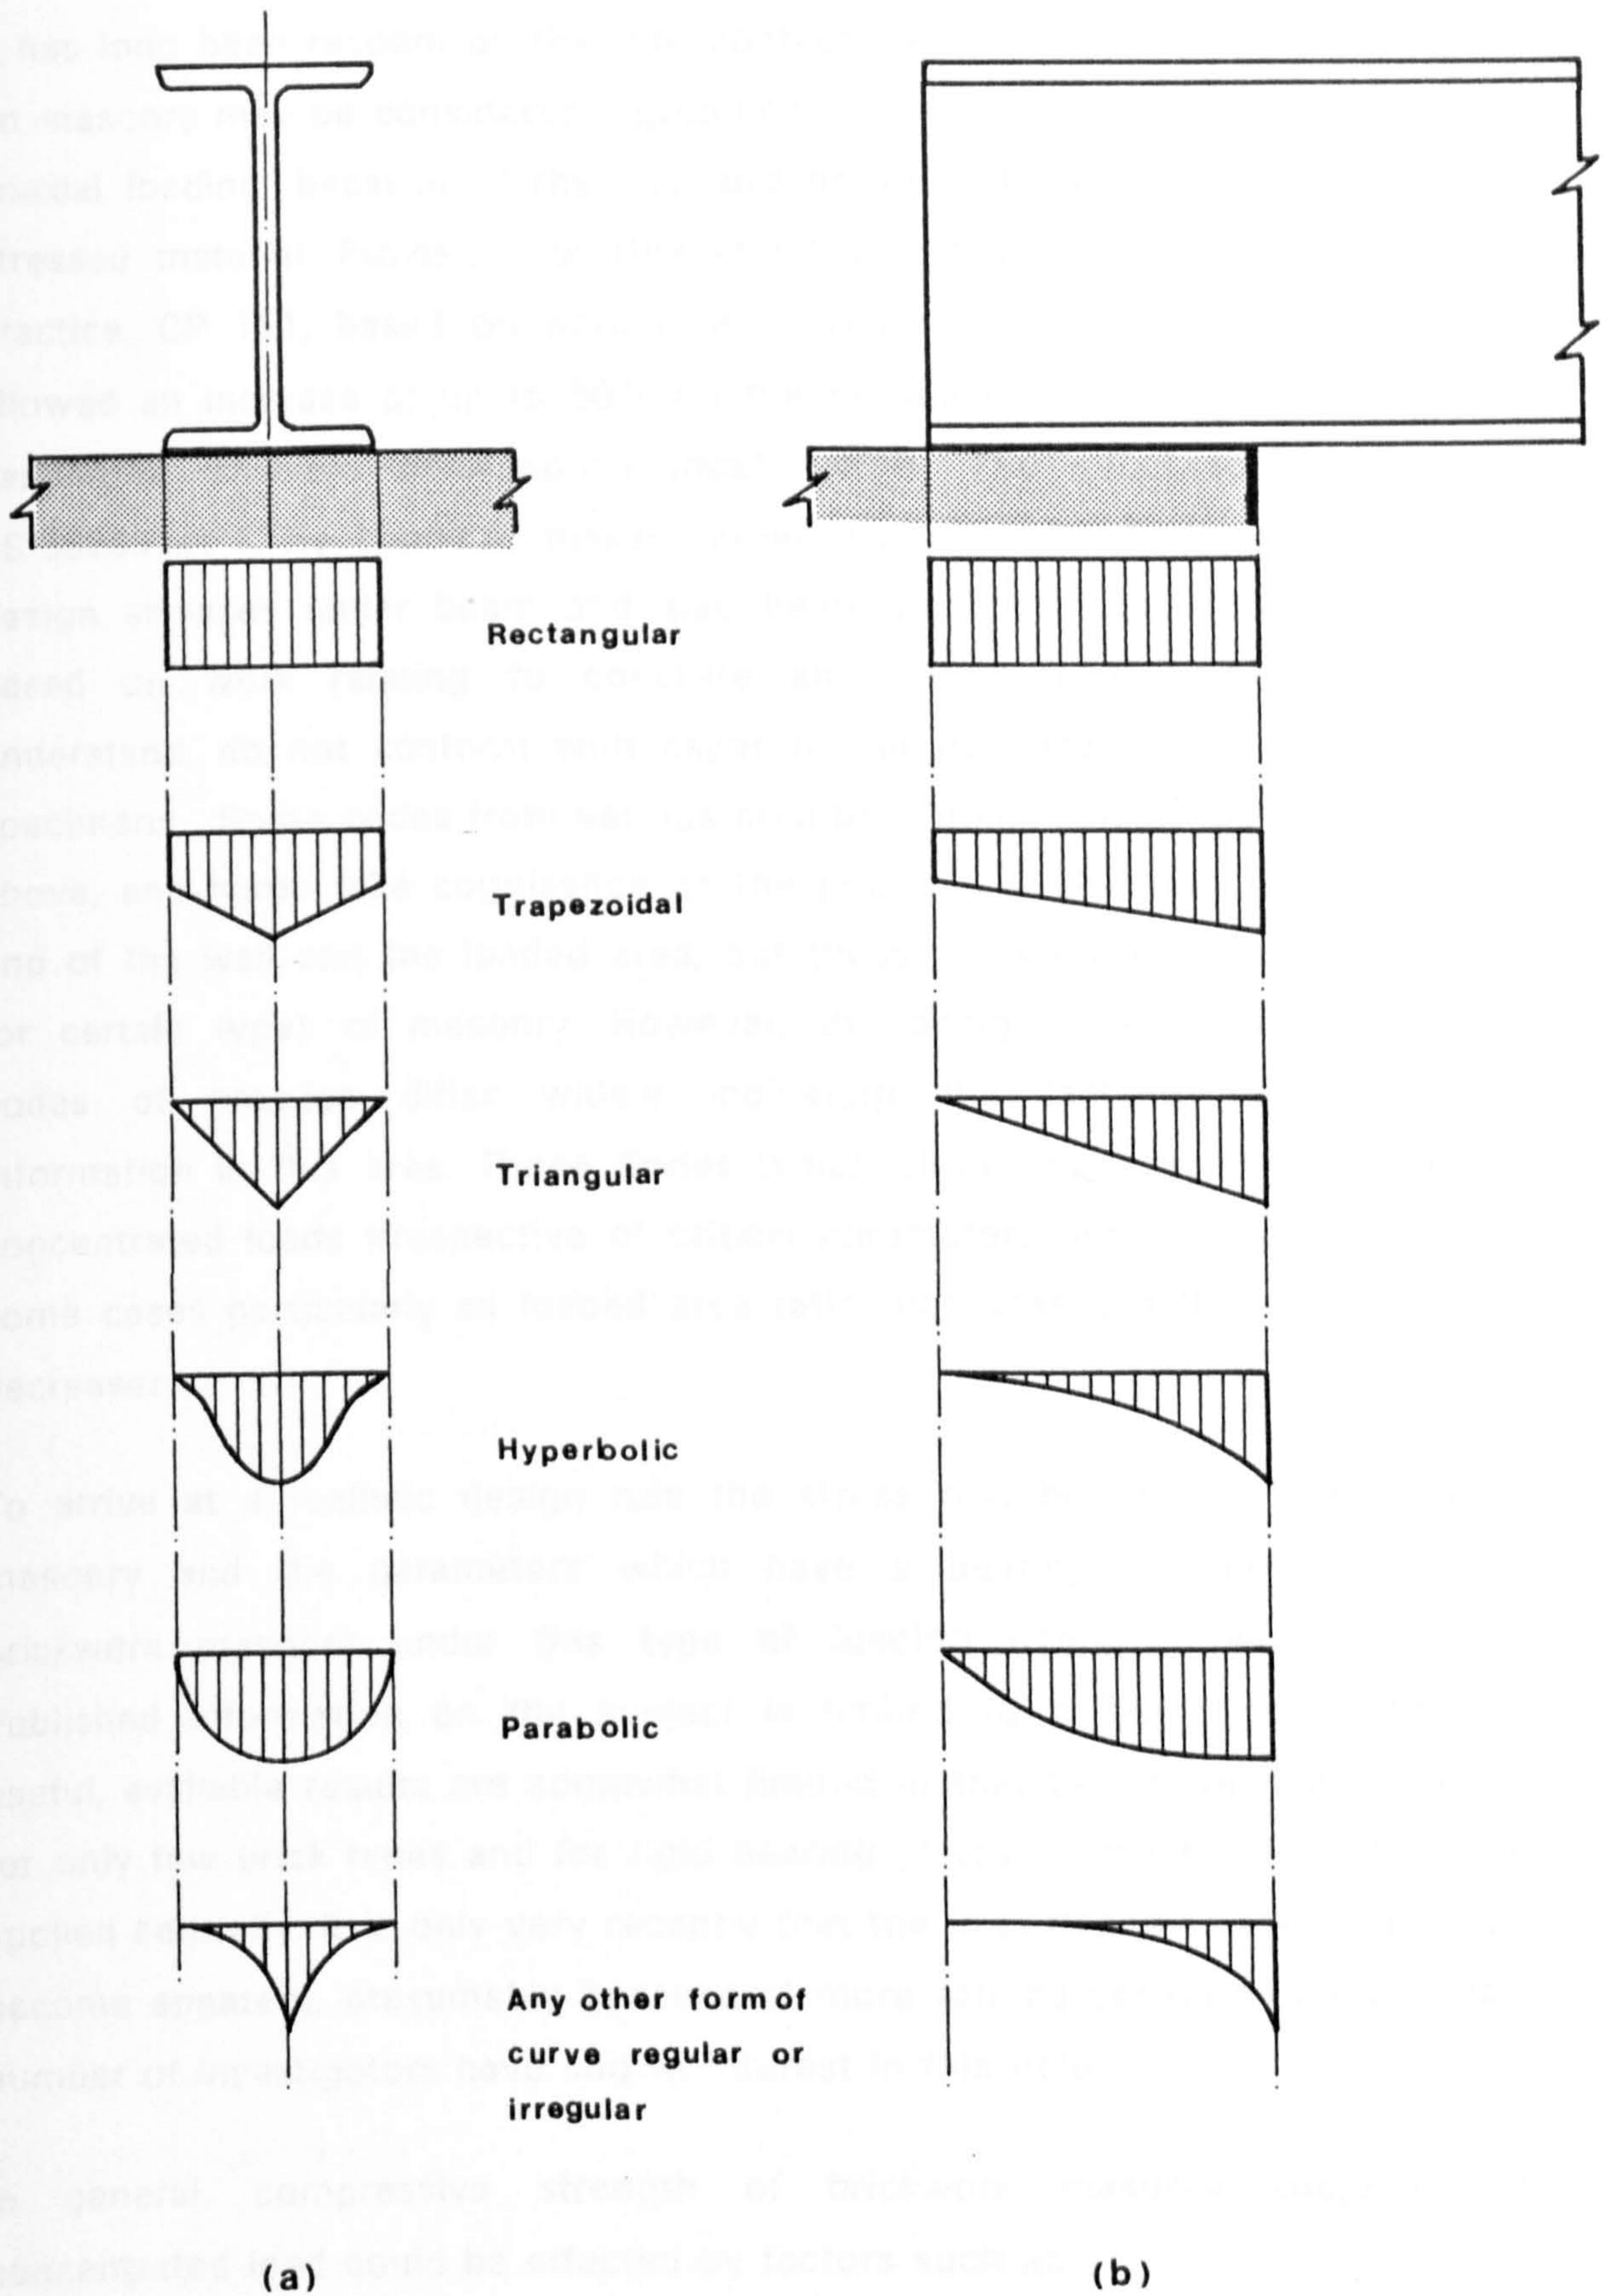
Typical stress blocks under steel beam applying concentrated load.
